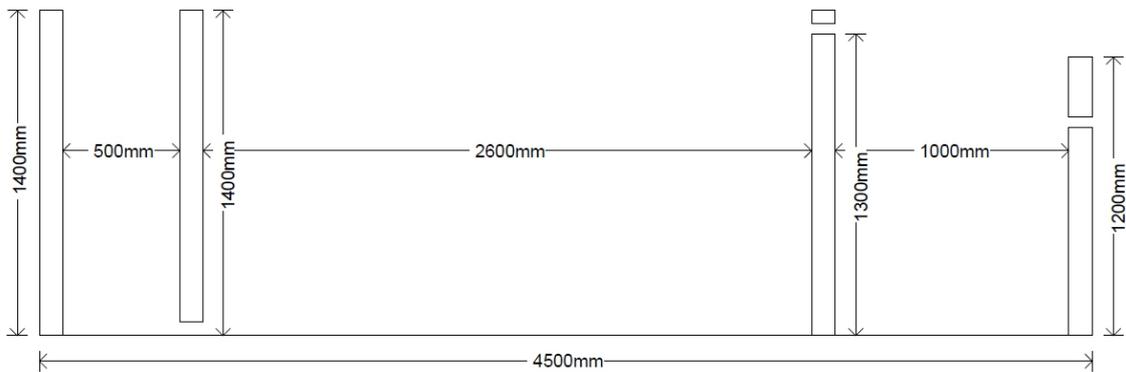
Our Construction Plan for The New Grease Trap Section (cross section)
